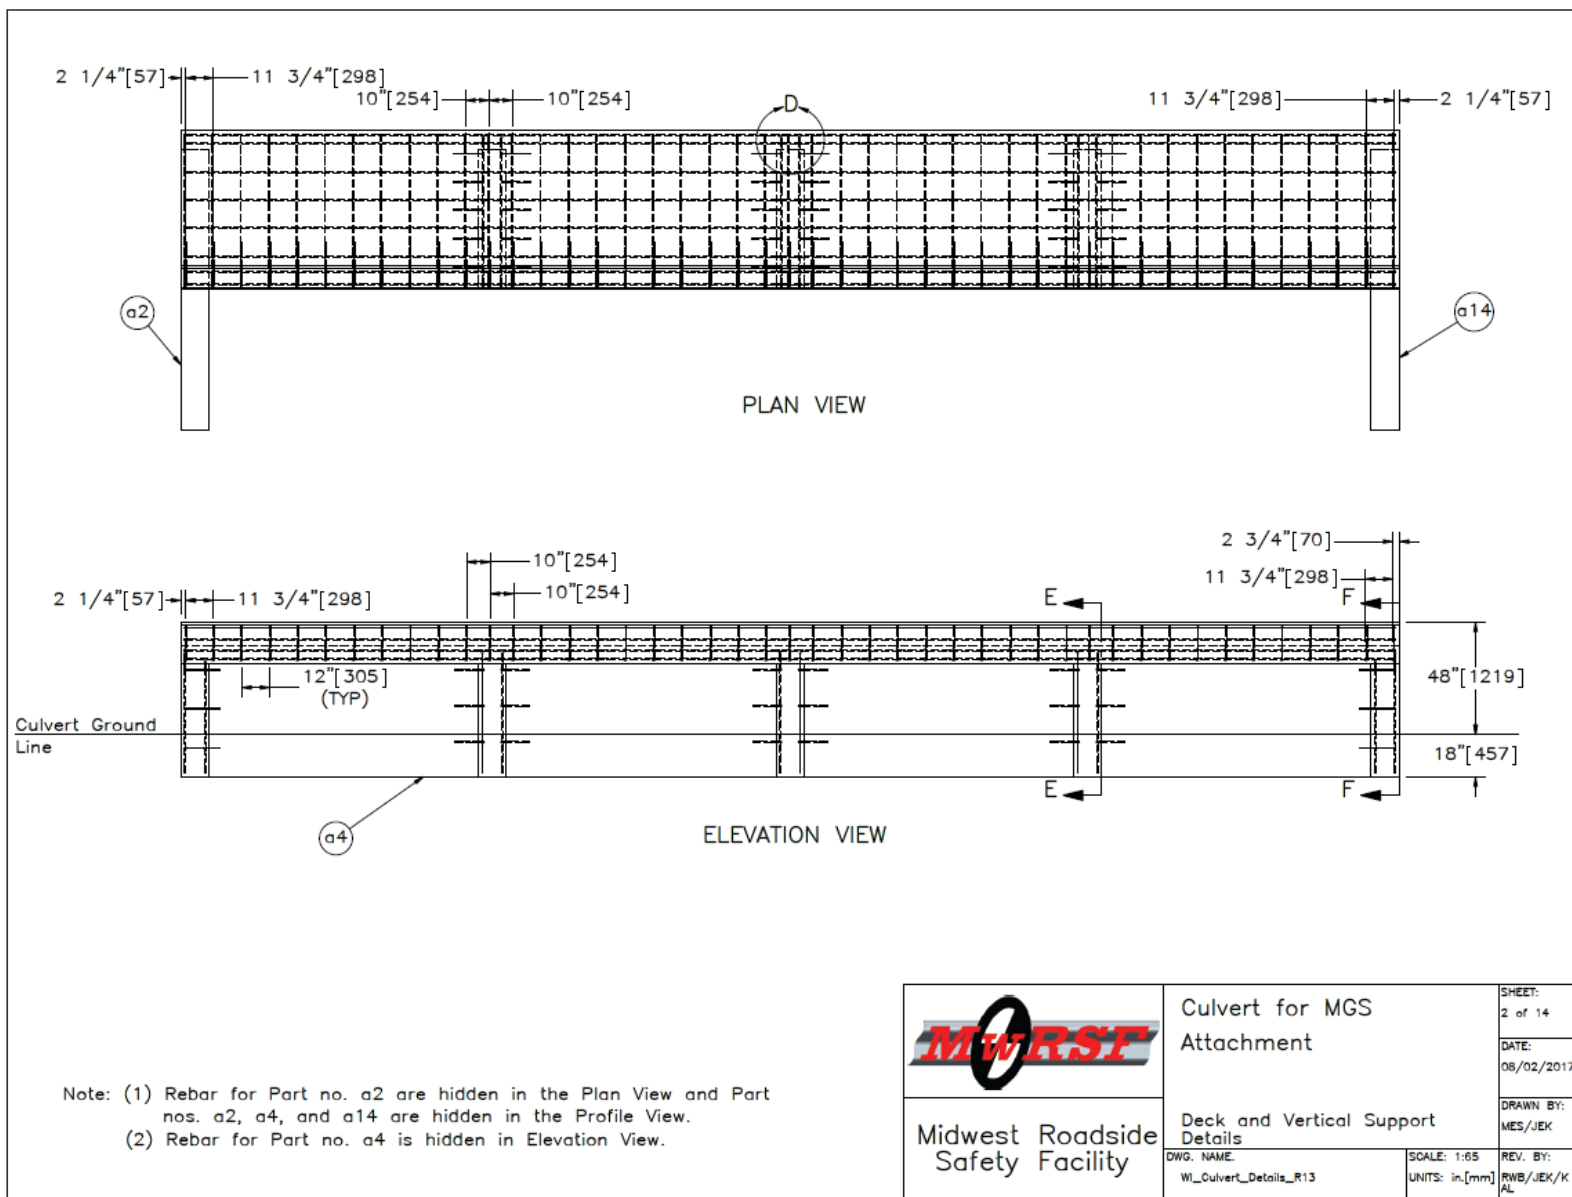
Top Slab and Vertical Support Wall Details, Test Nos. CMGS-1 and CMGS-2
